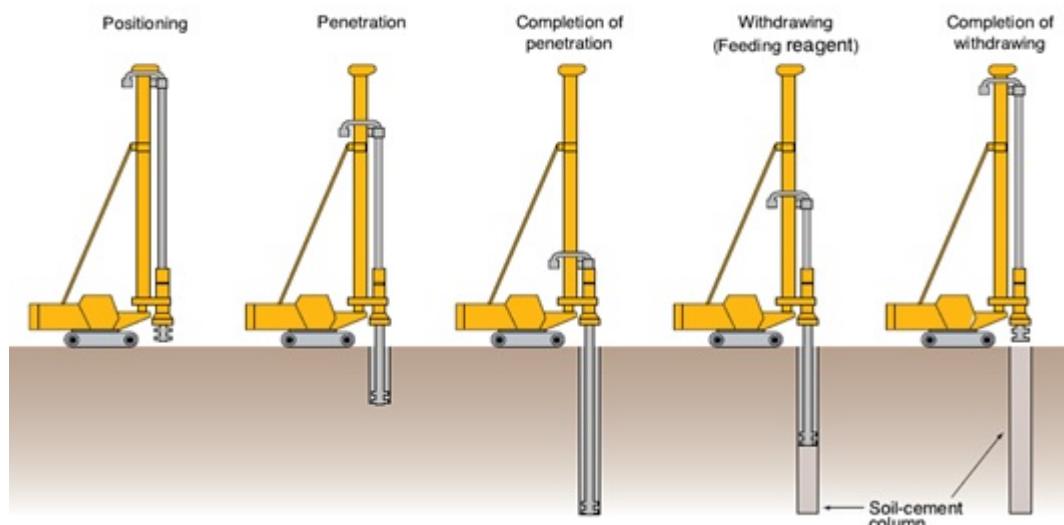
Construction sequence of the columns in a DMM method (Raito kogyo co., ltd, DJM system).
